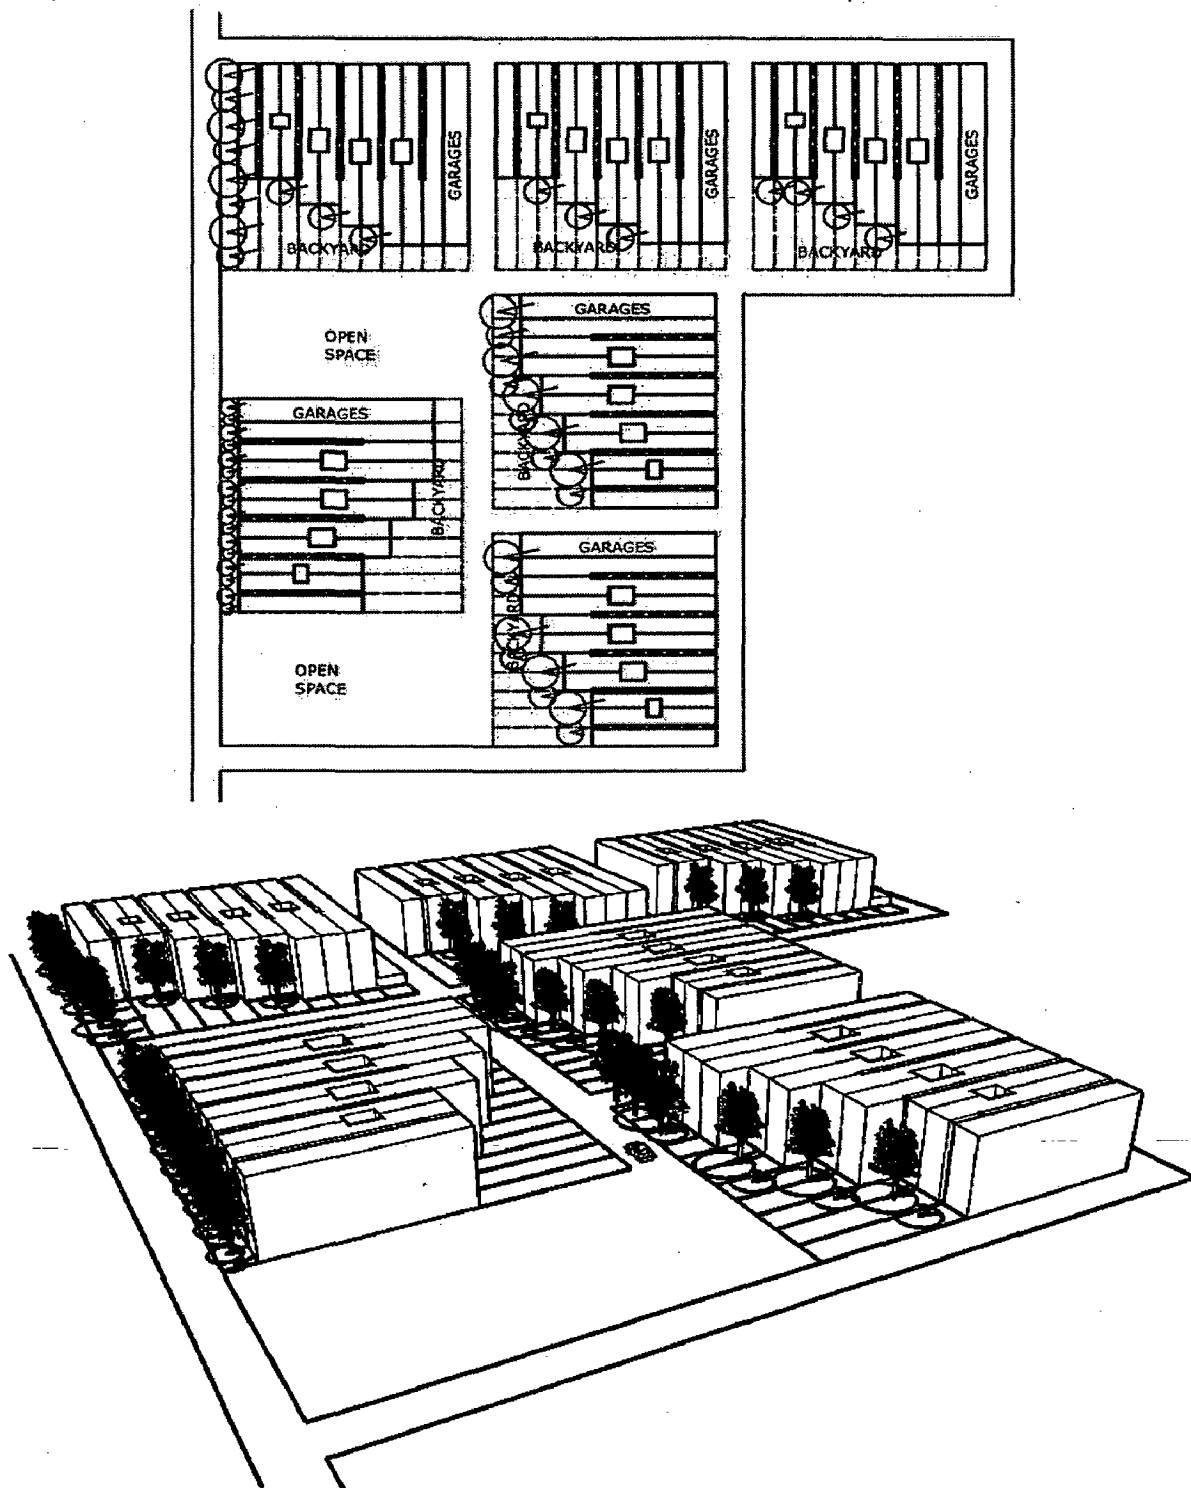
Site plan option and view in L-shaped site of Option-1
